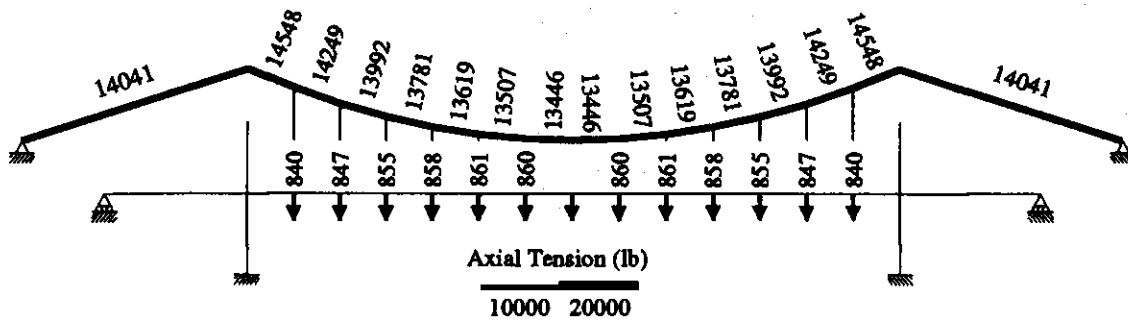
Dead Load Forces and Deflections in Truss of Stiffened Beveridge Bridge with Continuous Truss
